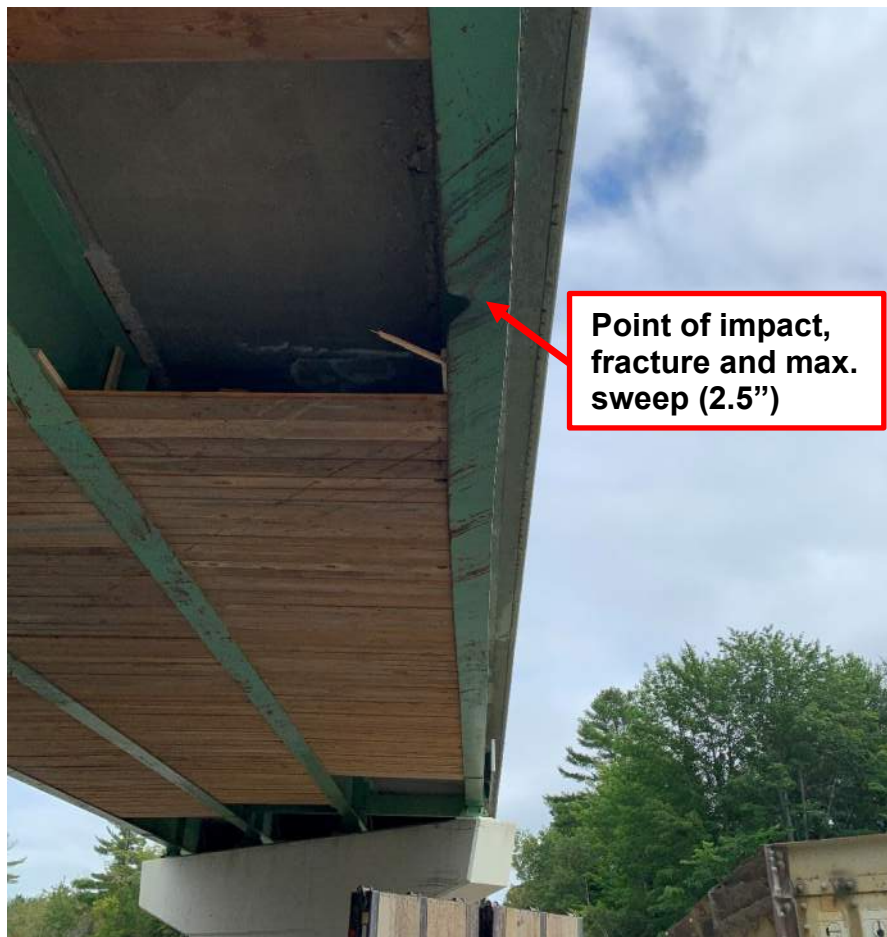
Girder G4 Collision Damage (Looking East)
